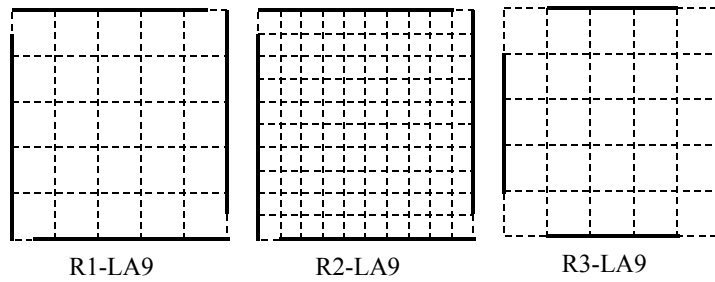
Floor Plans Showing Layout of Moment Resisting Frames for Seattle Model Buildings
